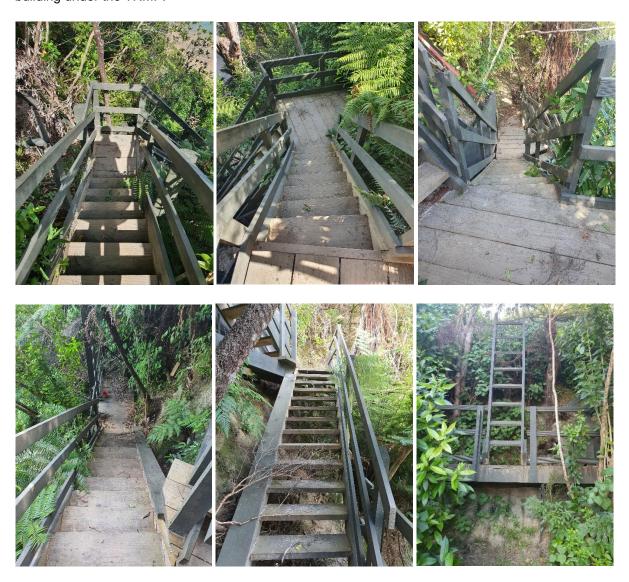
Photo L: Stairway that has been erected for pedestrian access from the beach to the property.
